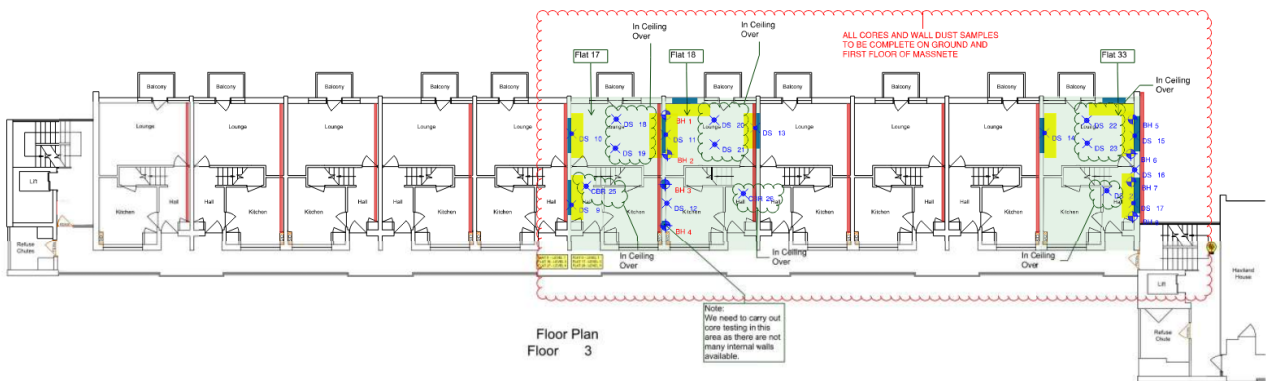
Third floor plan for John Cozens showing the flats inspected.
